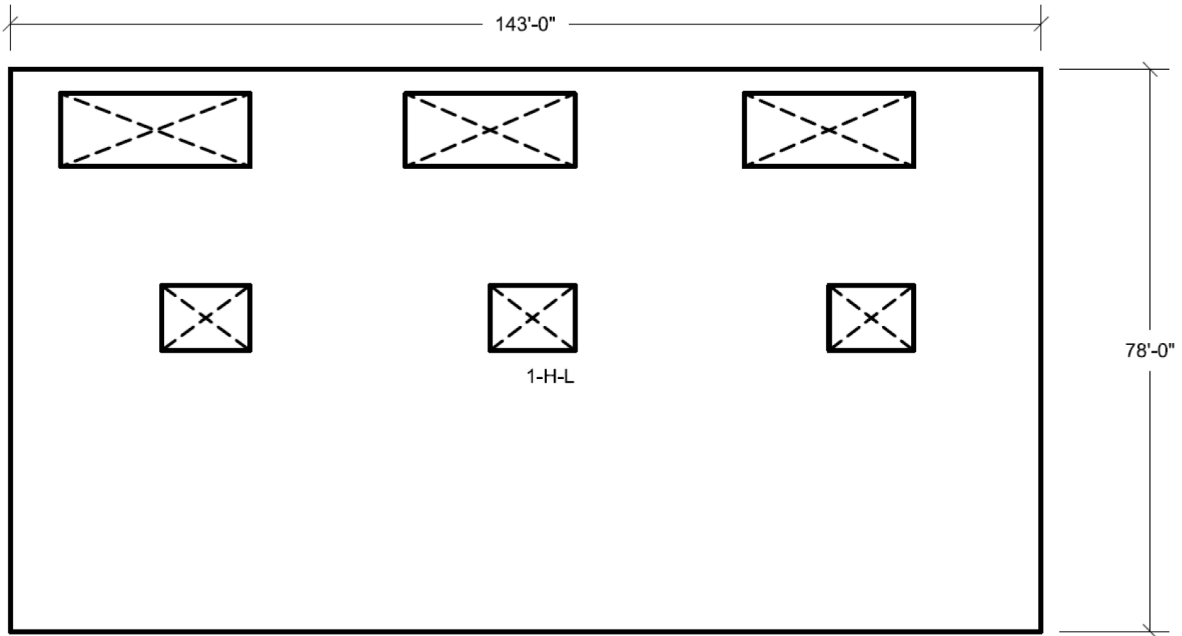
H.6-135 Pump House Roof East/West Reinforcement Zones Top Face
